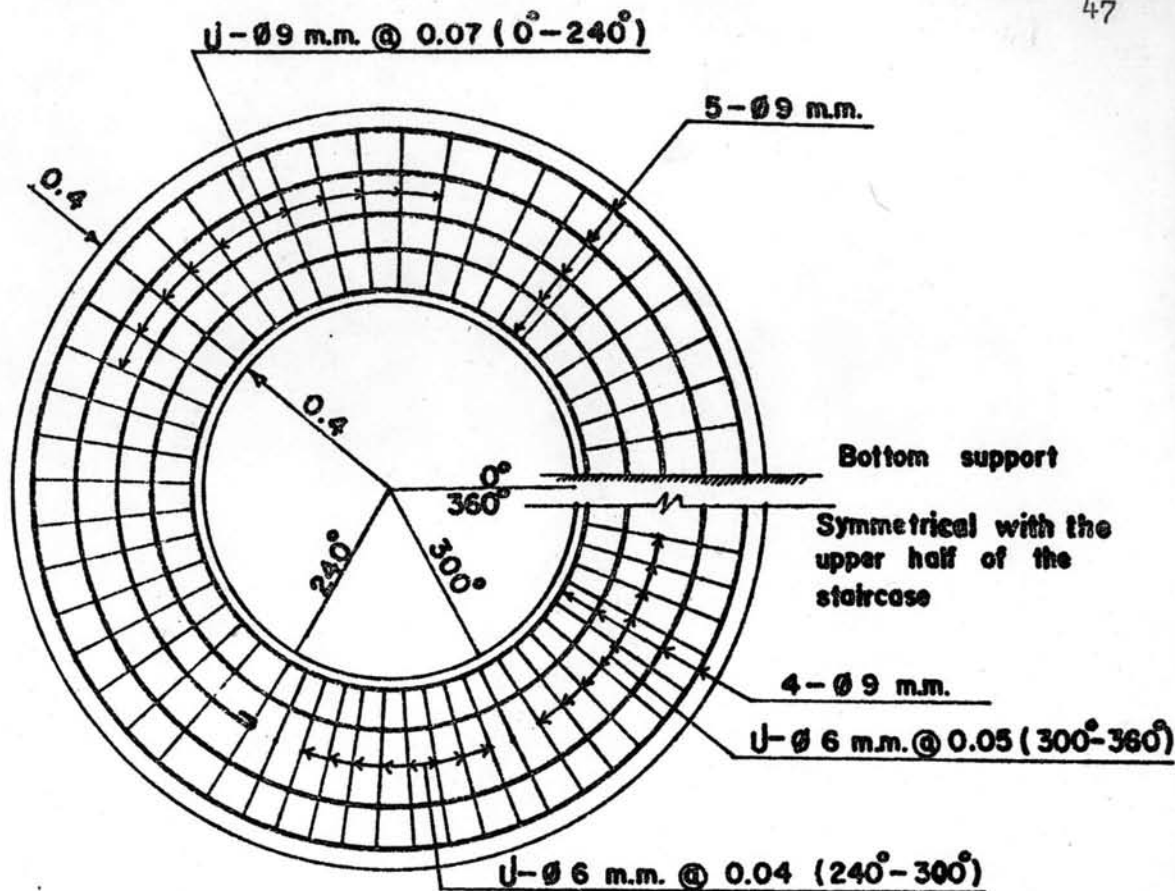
Detail of reinforcement at the bottom face for lower half of the staircase
